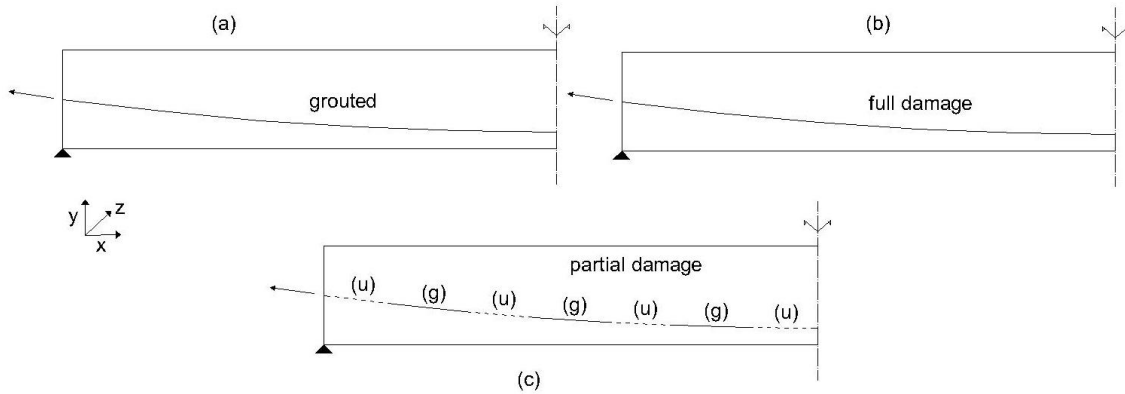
Configurations: (a) grouted, (b) full damage and (c) partial damage
